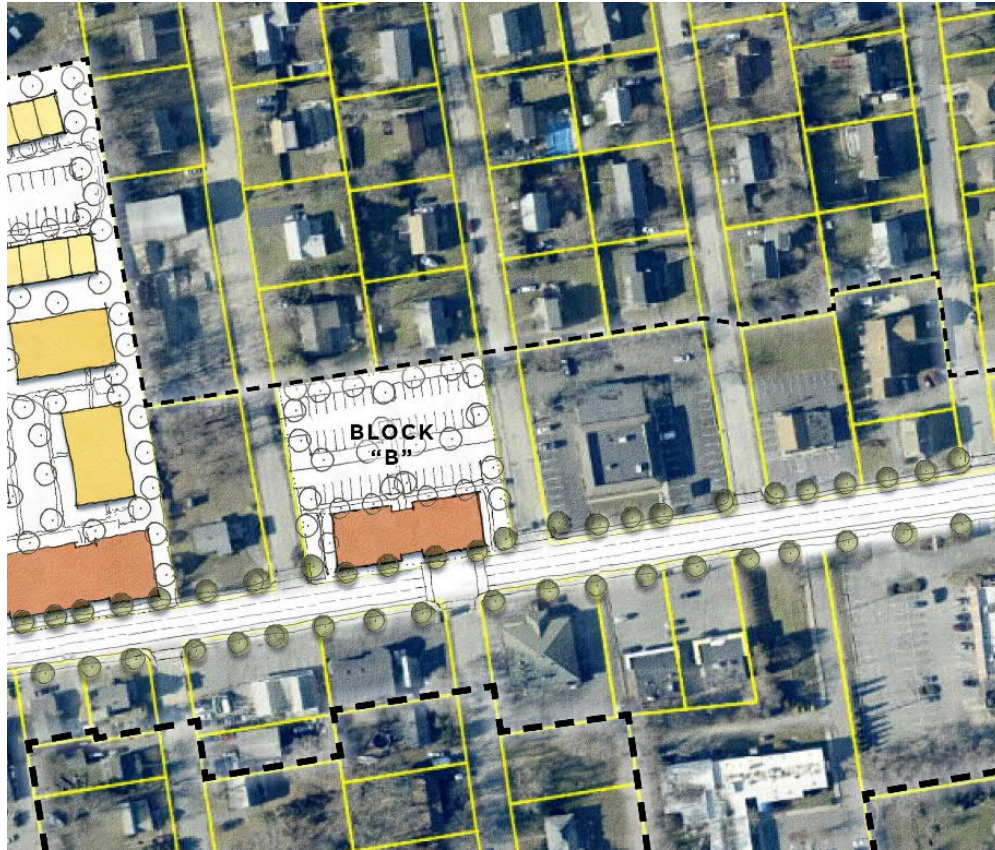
Ridgeway & Canario (Block B) Concept Plan
